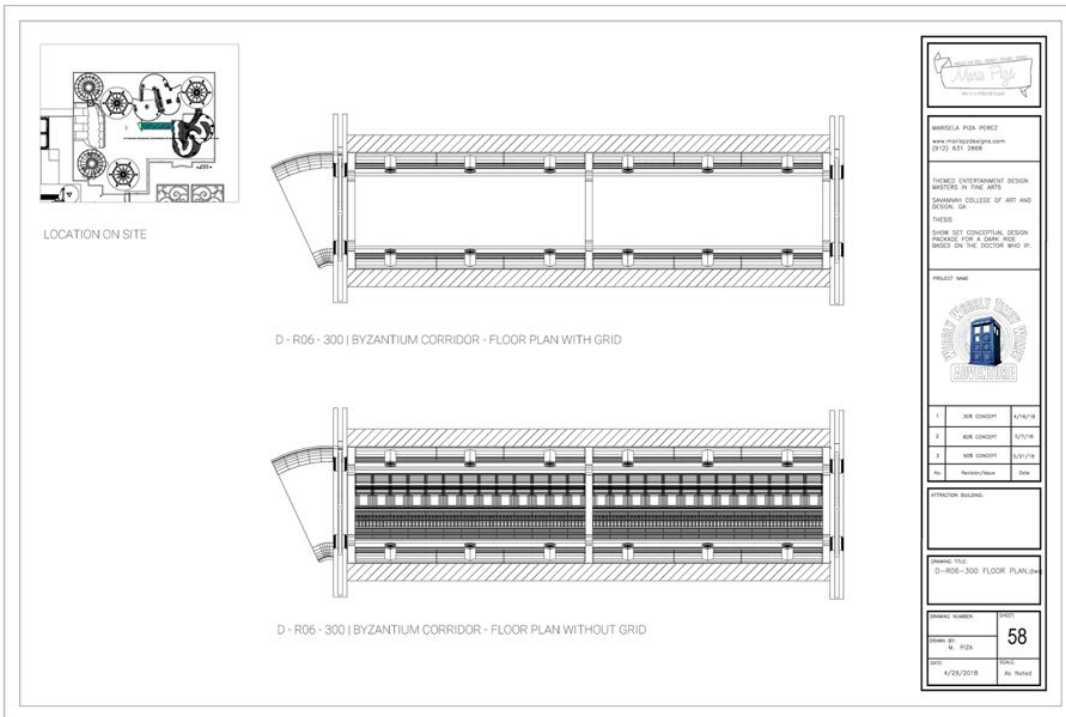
D-R06-300 | Byzantium Corridor - Floor Plan
